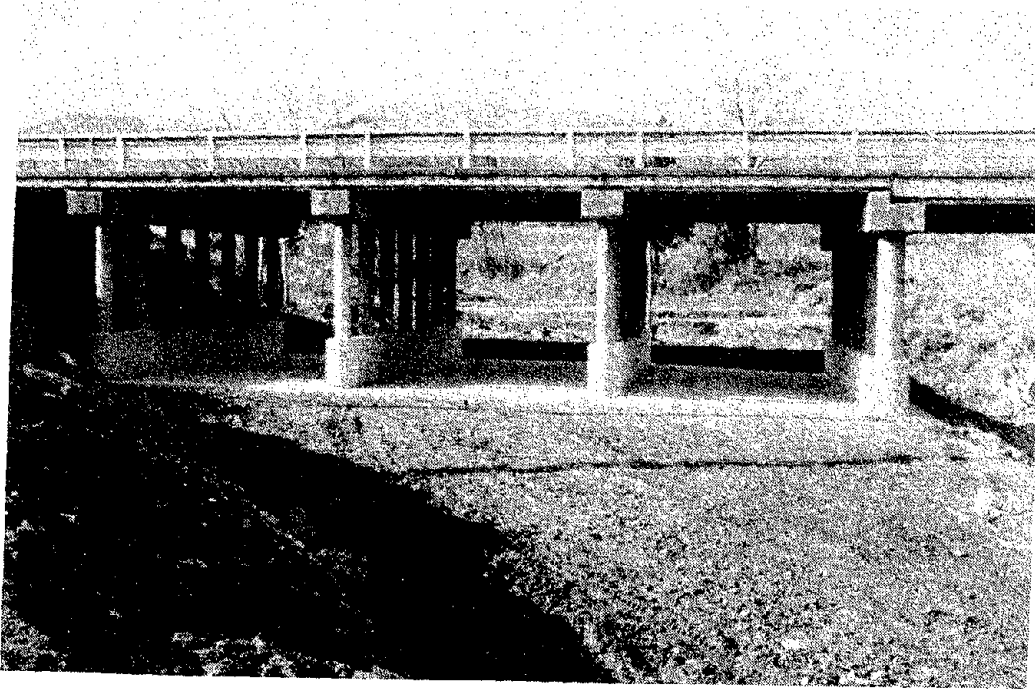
Seismic Strengthening of Bent Piles by New Concrete Walls and New Connection Slabs
